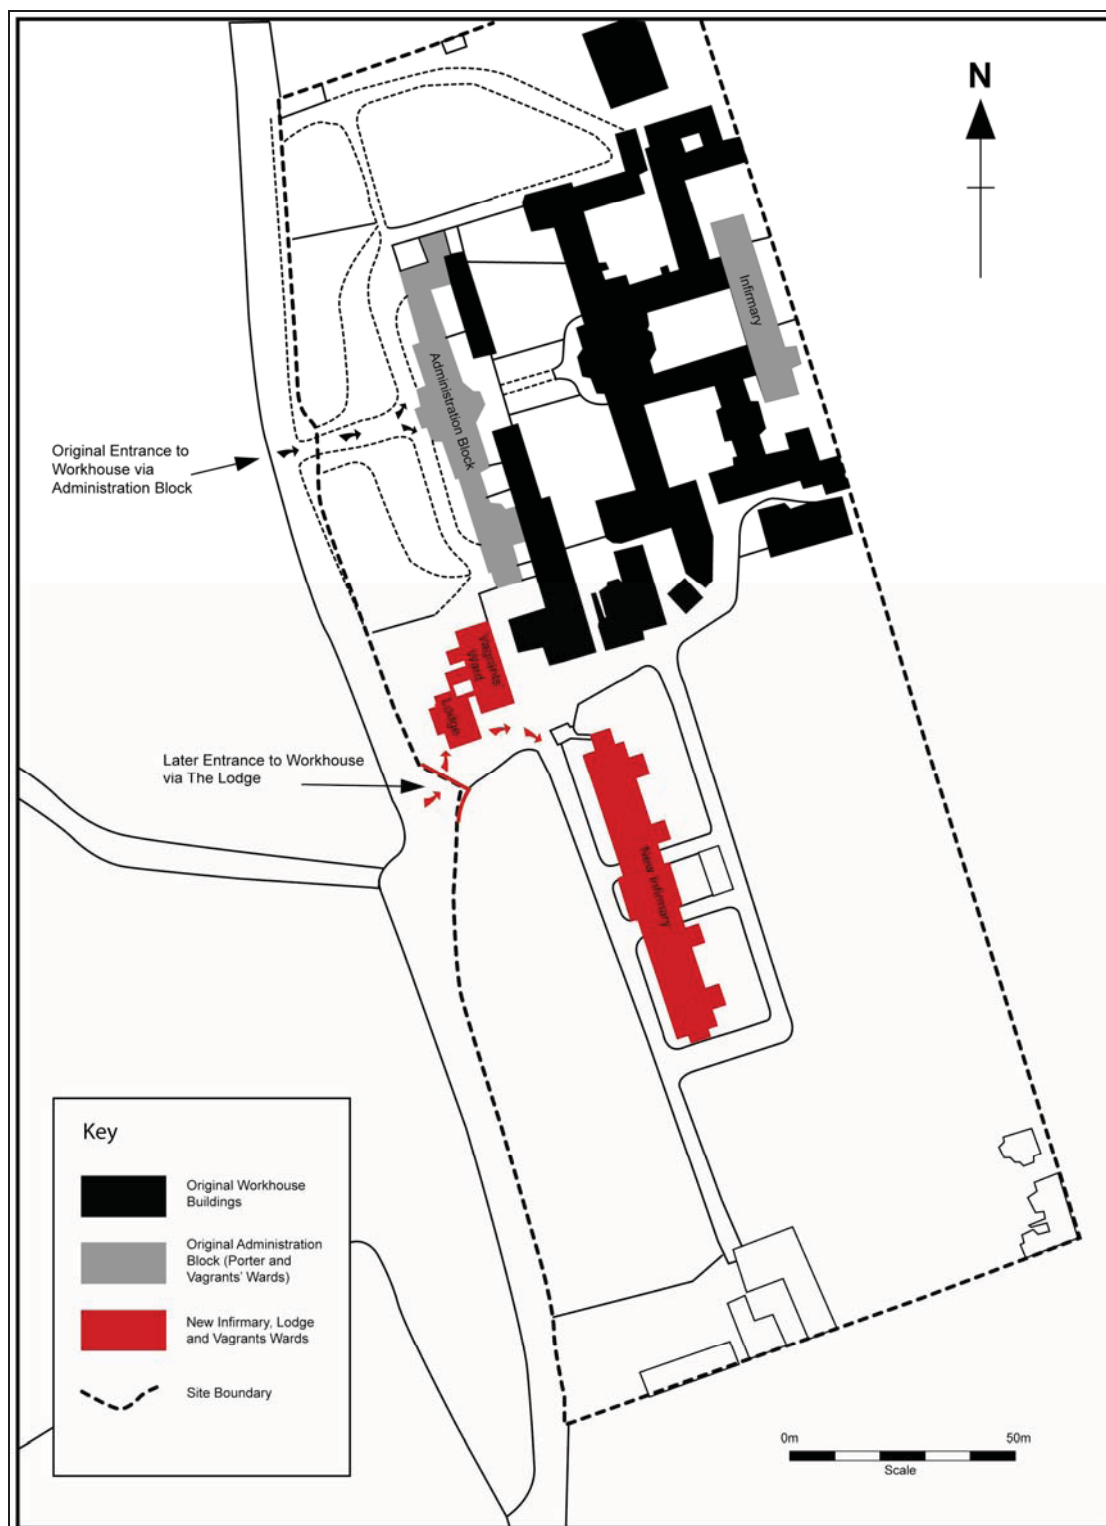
Plan of the workhouse site showing the original entrance and buildings and the 1894 entrance and buildings.
